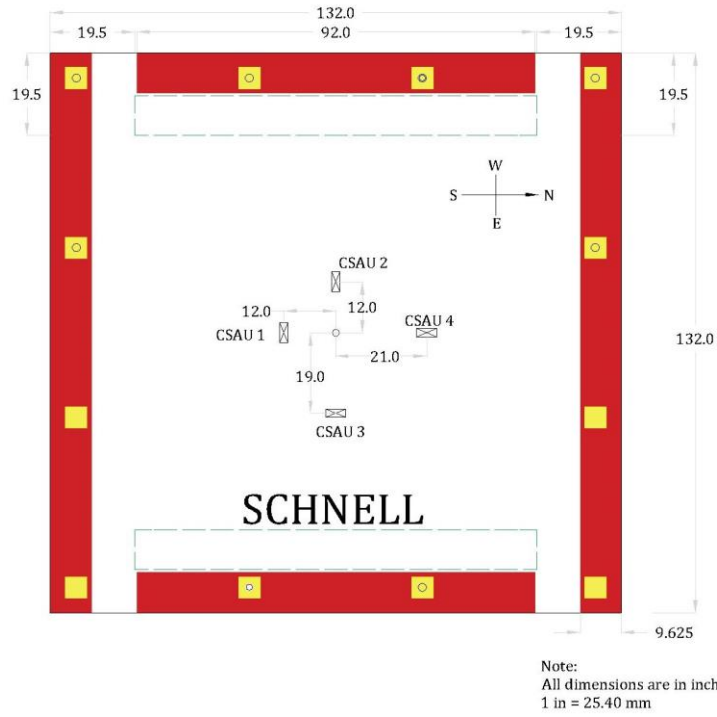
Concrete Strain Gauge Location for Slab Specimen A
